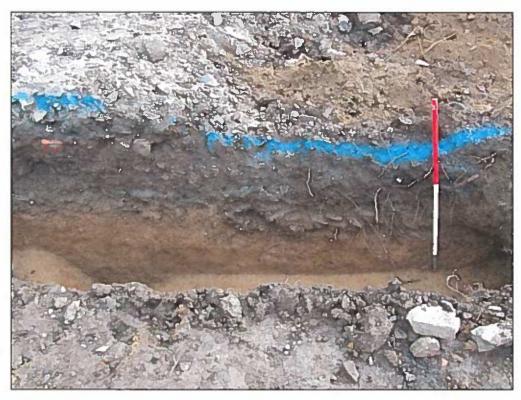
North-facing section of Foundation Trench 1 showing cut (332) for swimming pool and fills 333 and 334, looking south ©GGAT
